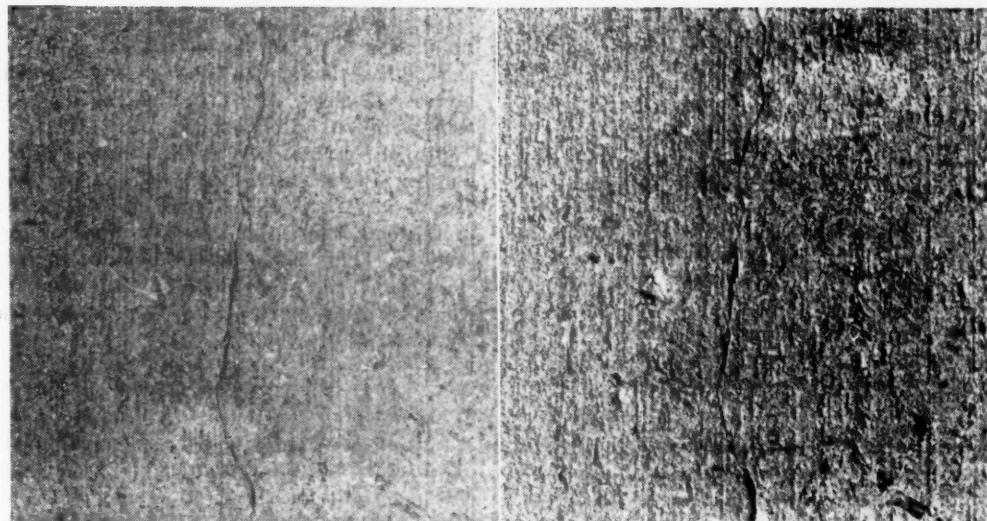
Surface condition of pavement in vicinity of the widest cracks observed in the central portion of the heavily reinforced sections (heavily traveled lane after 7 years of service).
